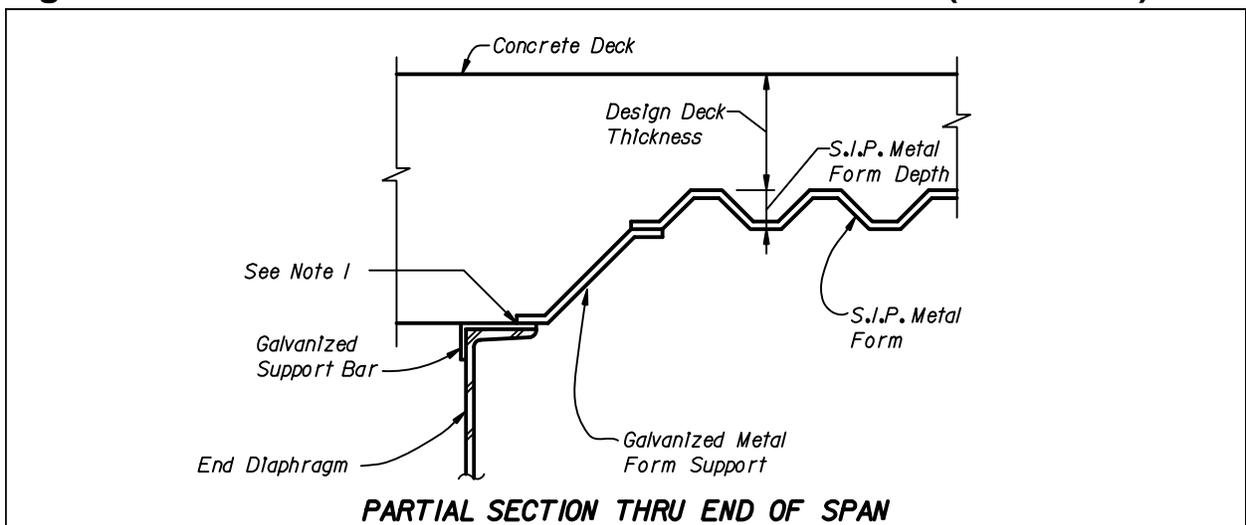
S.I.P. Form Details for Steel Box Girders (Section)
